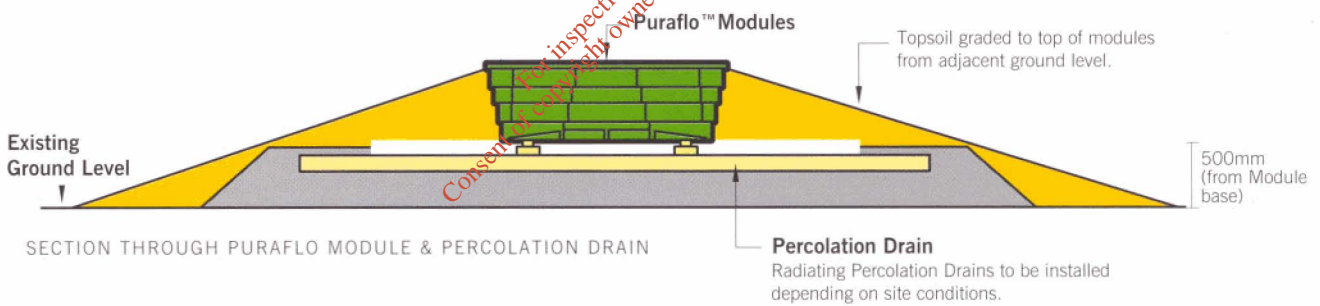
Disposal for Site with High Water Table. (Drawing not to scale)
